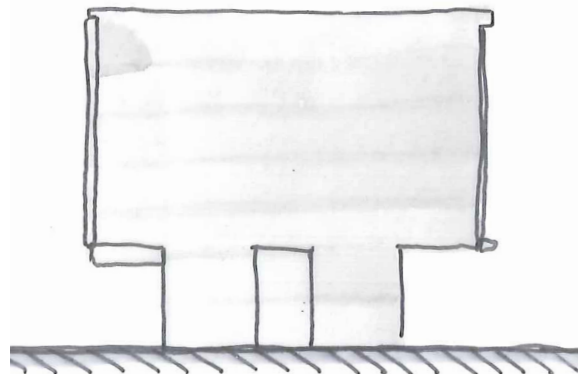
Original, concrete, east facade of the terraced houses in Vrieheide (own ill.)
